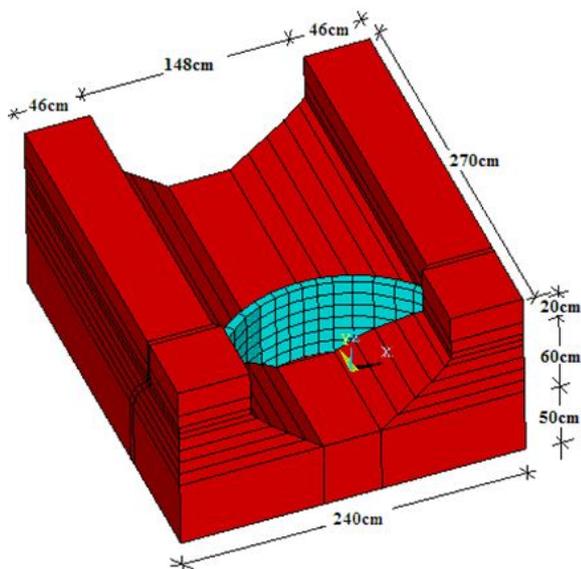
Type-1 arch dam-reservoir-foundation system and its dimensions
